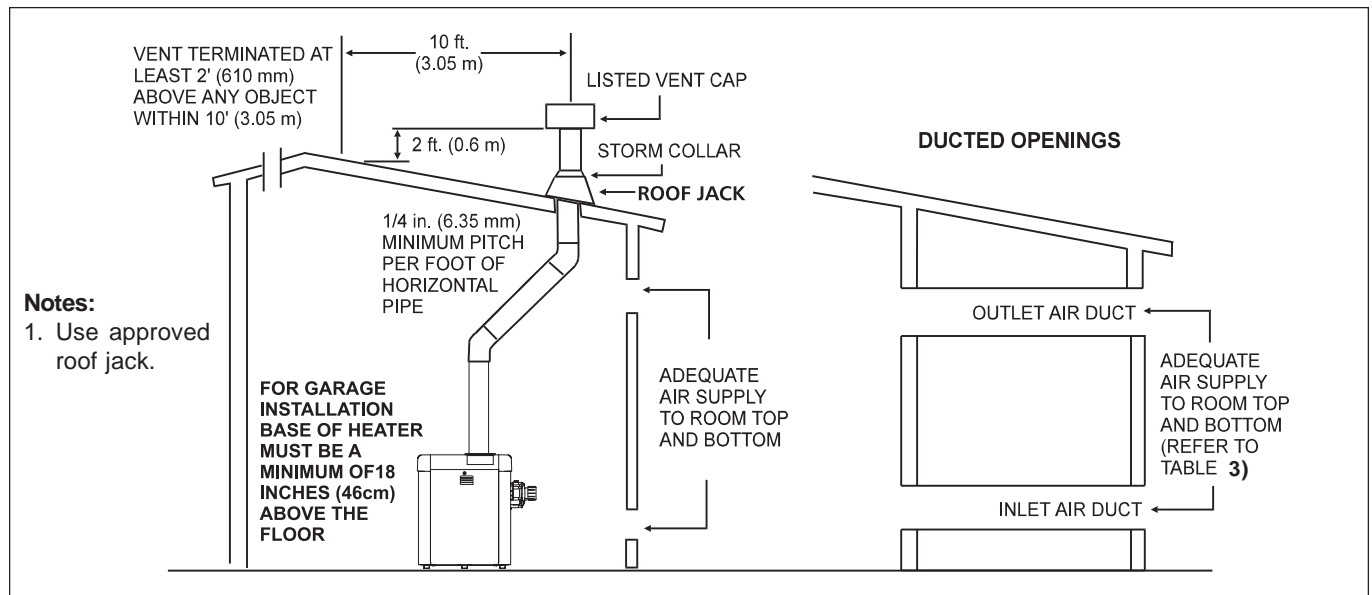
Indoor Installation Venting (USA), or Outdoor Shelter (Canada)
